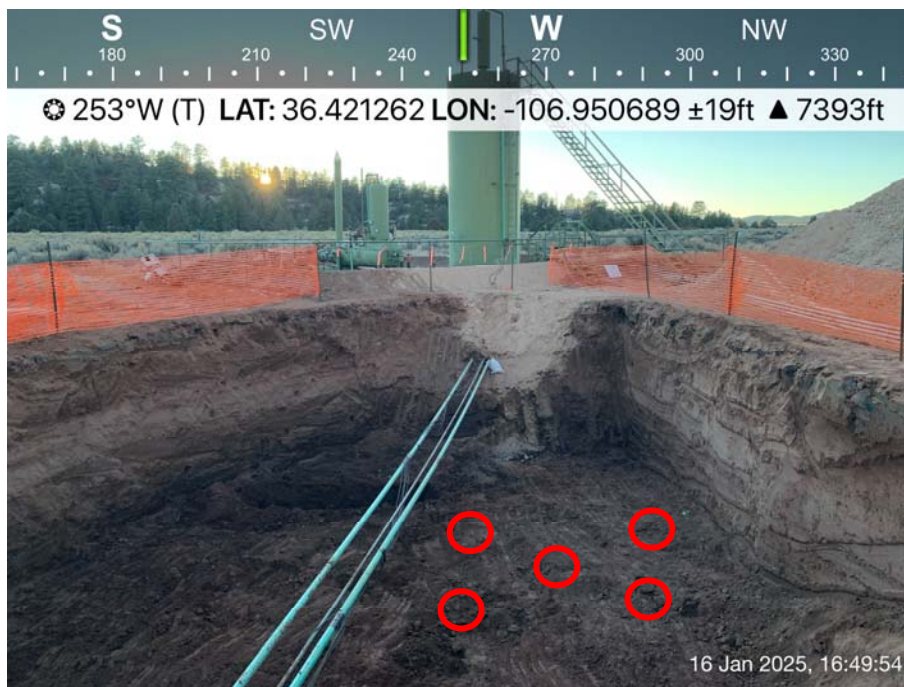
SS20 collected as a five-point composite sample from northern base of excavation.
